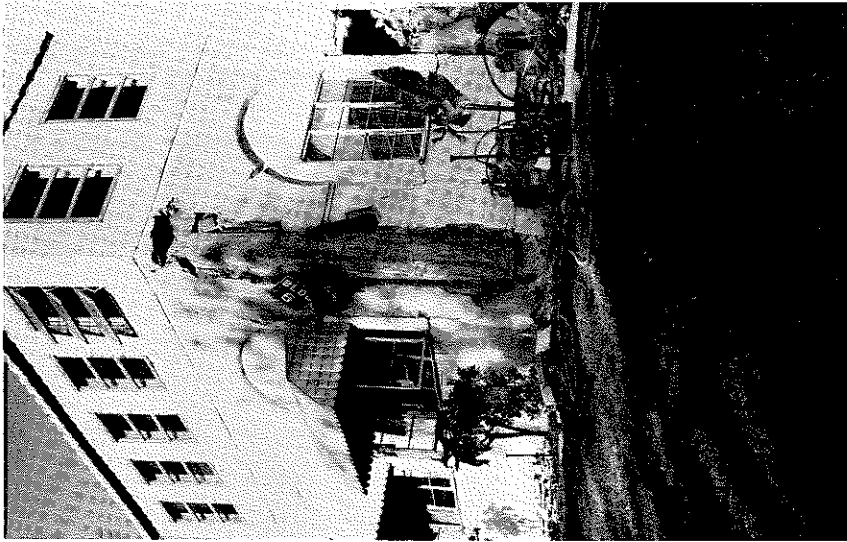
Failure of column at base, Infirmary Building (Bldg. 6), Veterans Hospital.
